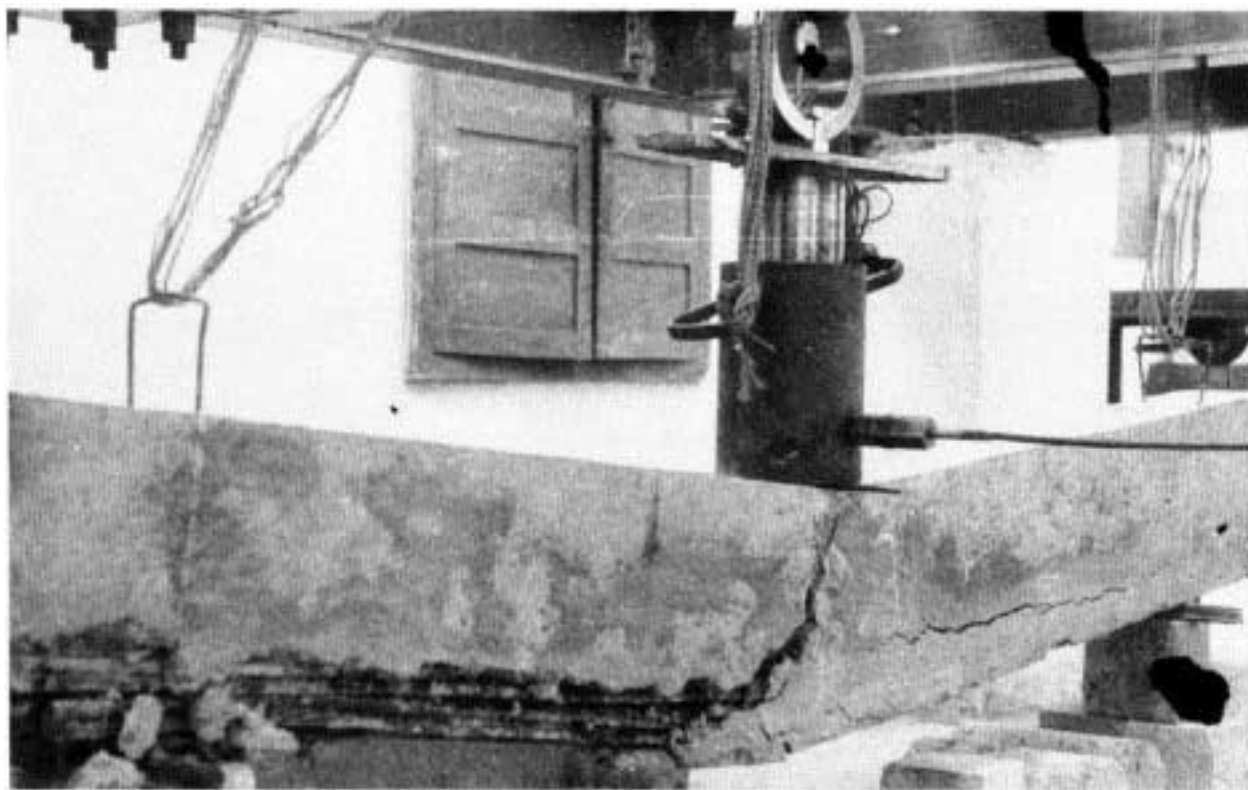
Bond failure of untreated bamboo-reinforced concrete beam (probing test).
